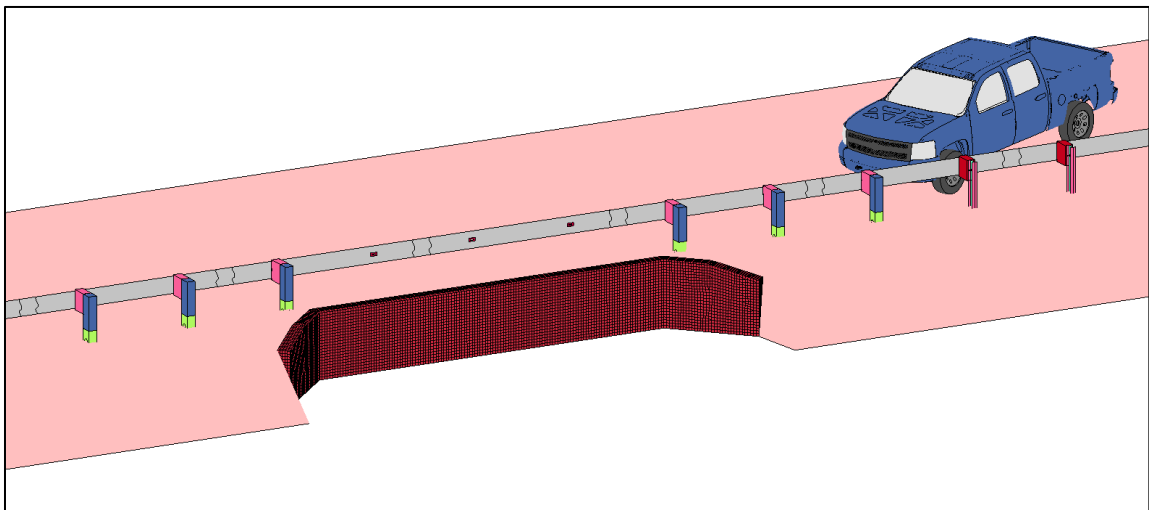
Double Wingwall Culvert, Test No. LSC-2
